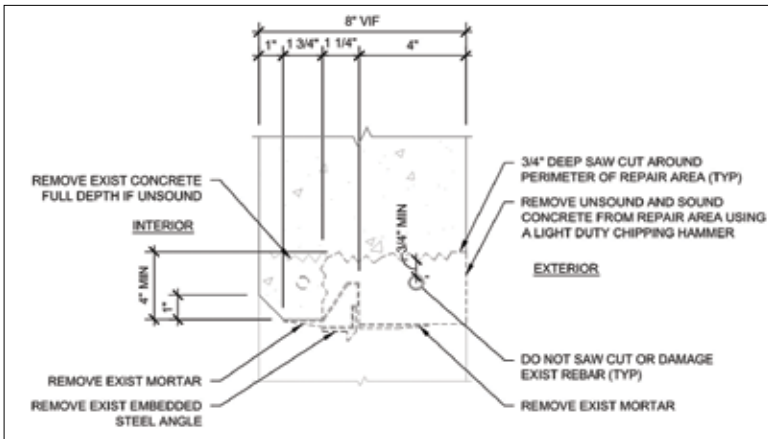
Repair sketch indicating location of steel angle embedded in concrete at window rough opening
